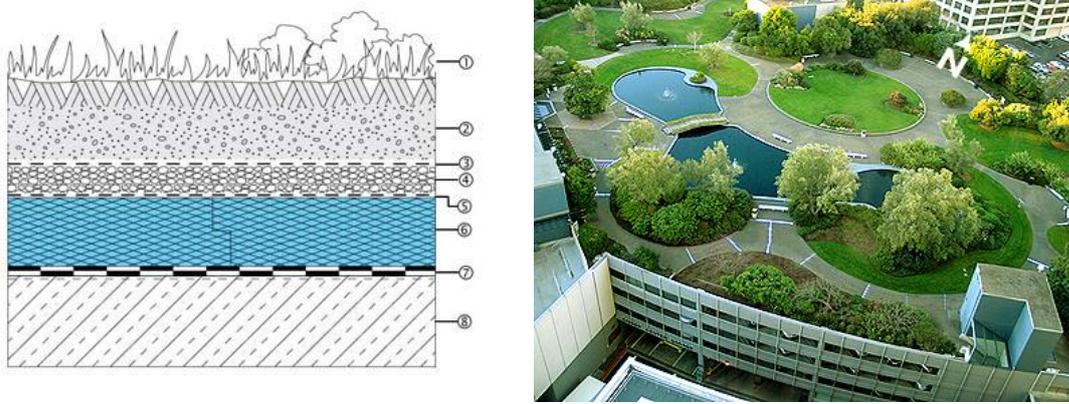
Extensive roof with drainage system: 1) extensive lawn – vegetation; 2) soil layer 80-100 mm thick; 3) separation/filtration layer; 4) drainage layer; 5) fabric (e.g. polypropylene) 110-140 g/m<sup>2</sup>; 6) insulation material; 7) bituminous waterproofing sheet; 8) concrete ceiling
